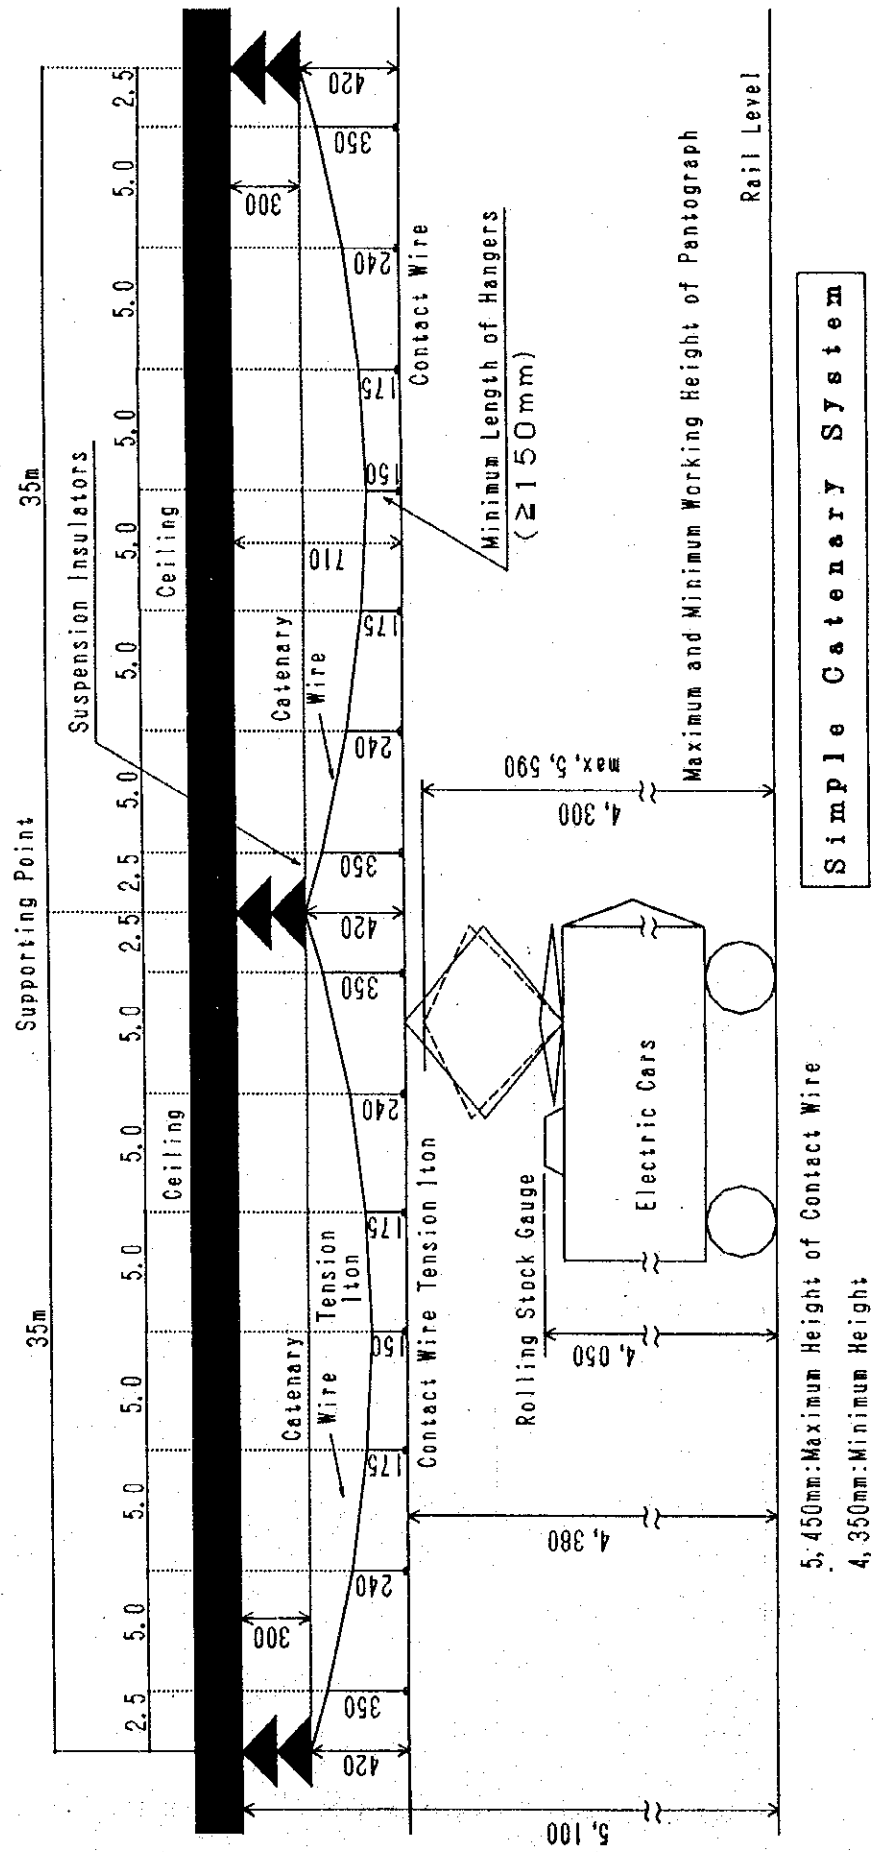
Contact Wire Height in Underground or Tunnel
